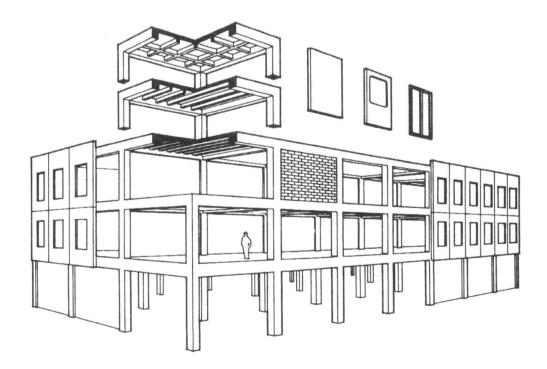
Typical non-ductile concrete frame. From Lagorio and others, 1986.
